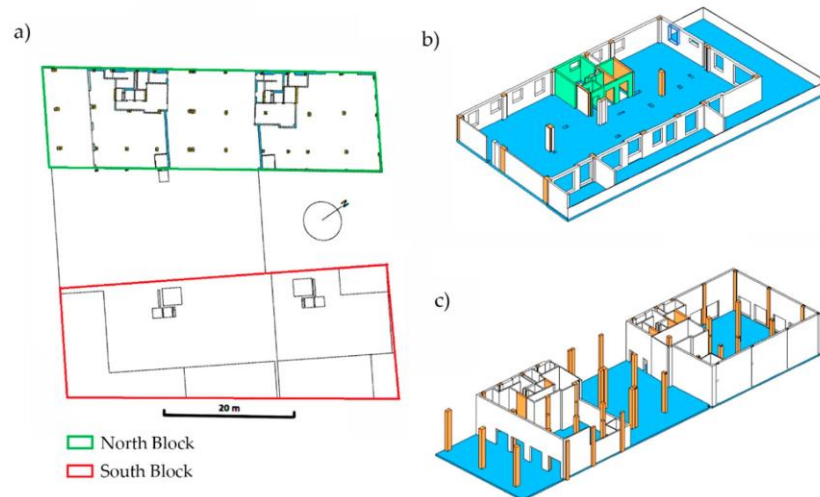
Building selected as case study: (a) 2D planes of the buildings. (b) Building information modelling (BIM) model of the first floor in the north block selected as the first study case. (c) BIM model of the ground floor in the south block selected for the second study case.
